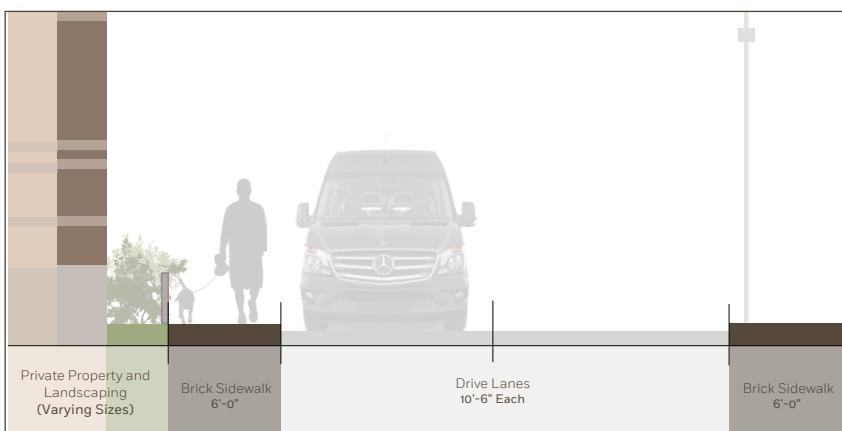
N. Second Street Corridor: Existing Conditions Section and Photo
